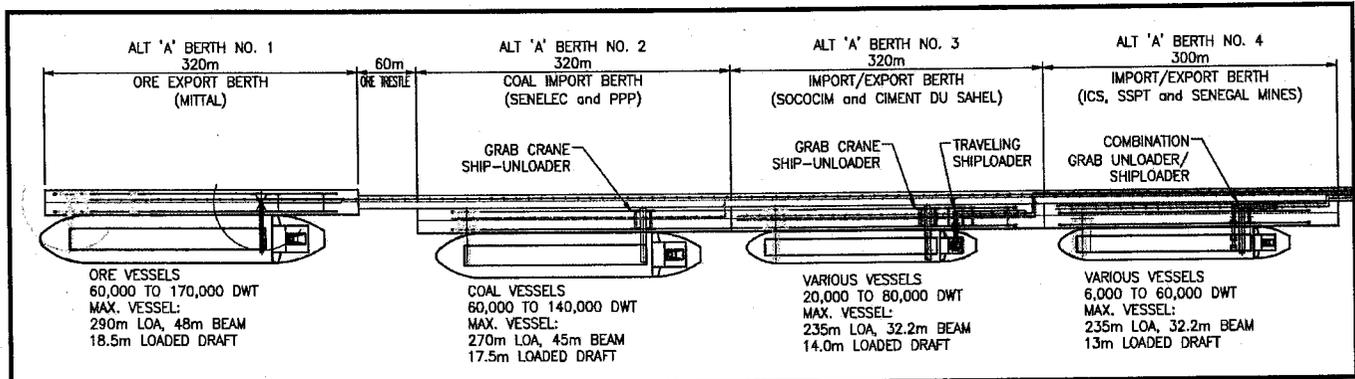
Berthing plan for principal stakeholders (from drawing SP-2A)
